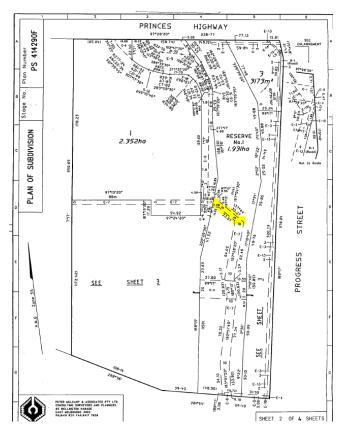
Plan of Subdivision showing drainage easement, connecting through to 7 Princes Highway and the creek reserve.
